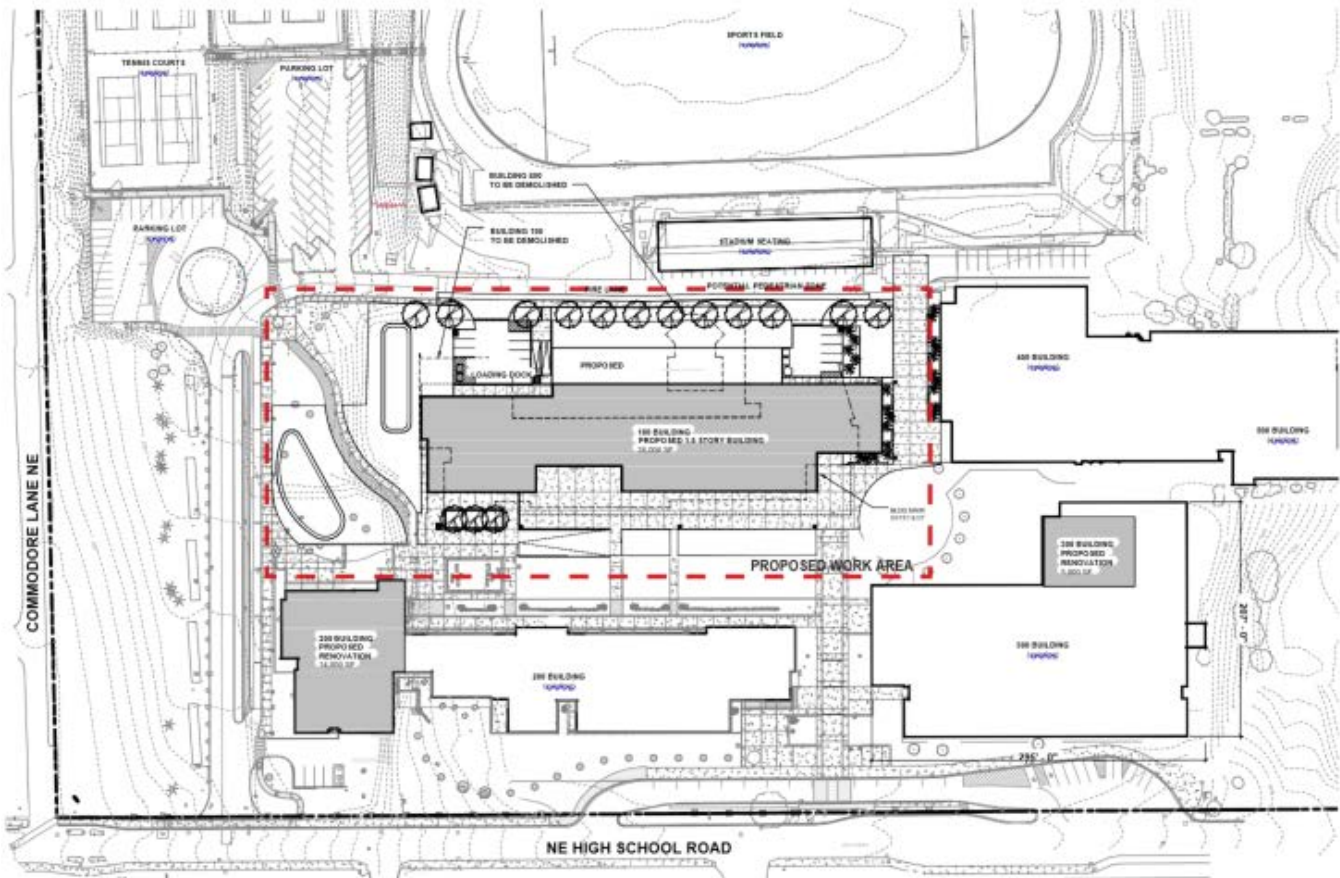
Bainbridge High School – Conceptual Site Plan Overlay / Demolition & Construction Areas
